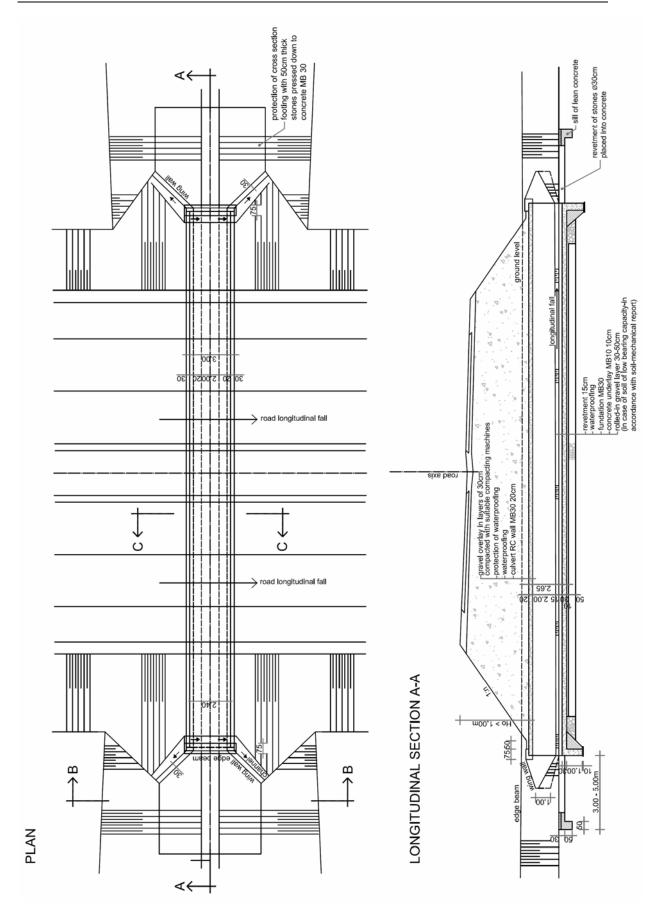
Example of layout of an arch culvert with an opening of 2.00/2.00 m
